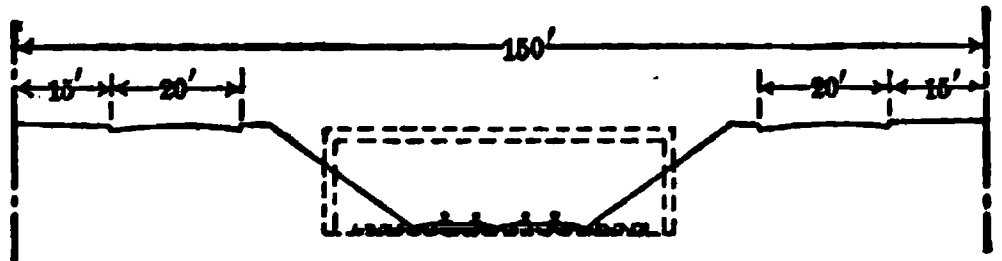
Showing a Double Track Rapid Transit Railroad with Side Slopes in a Street 150 ft Wide, with a View to Converting it into a Four Track Underground Road when Necessary
